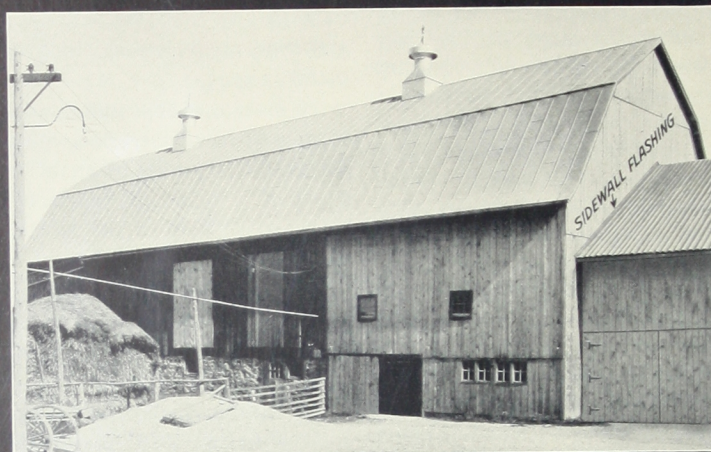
Where Corrugated Side-wall Flashing should be used.
